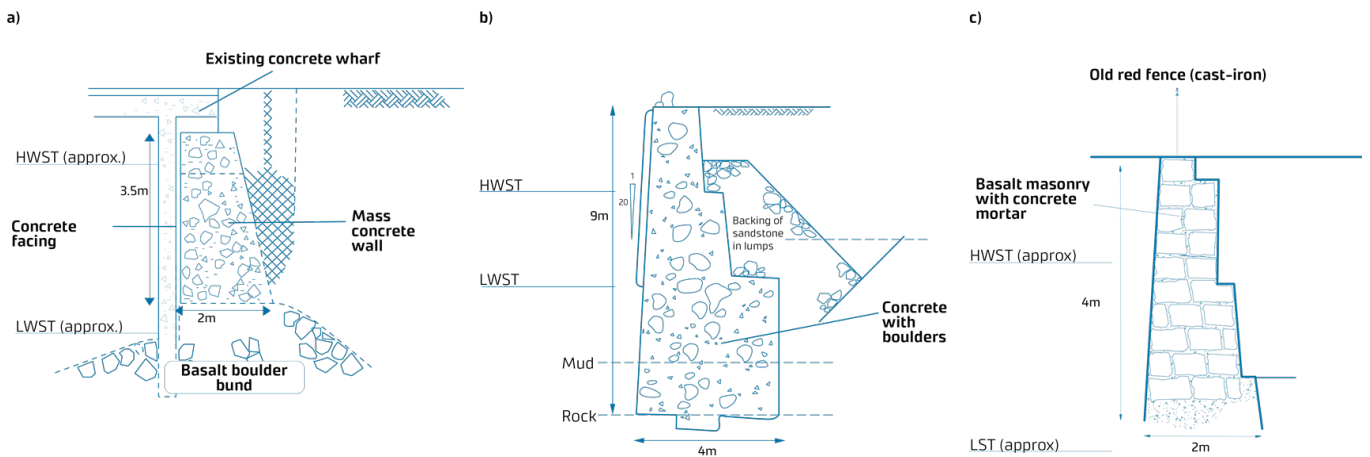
The different types of Quay Street seawall – a) Princes Wharf and Ferry Basin section, b) Ferry Building section, and c) Queens Wharf to Marsden Wharf section (dimensions are approximate) (T+T, 2012b).
